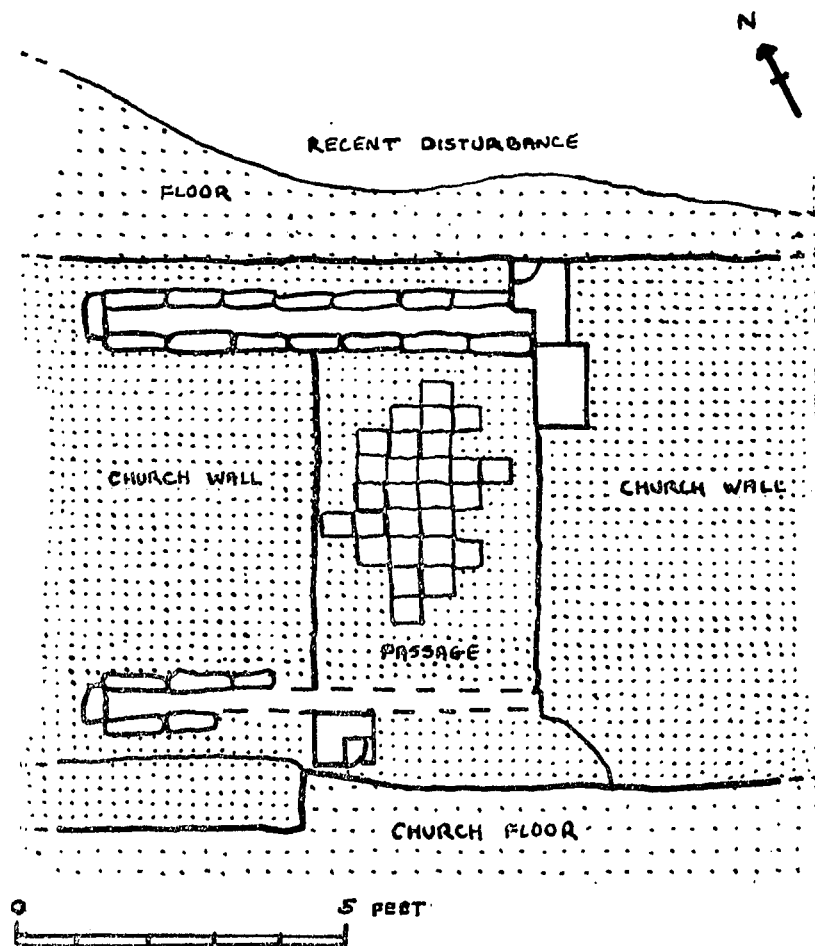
The Dominican Priory, Canterbury: Plan of Passage in north Wall of Church.
